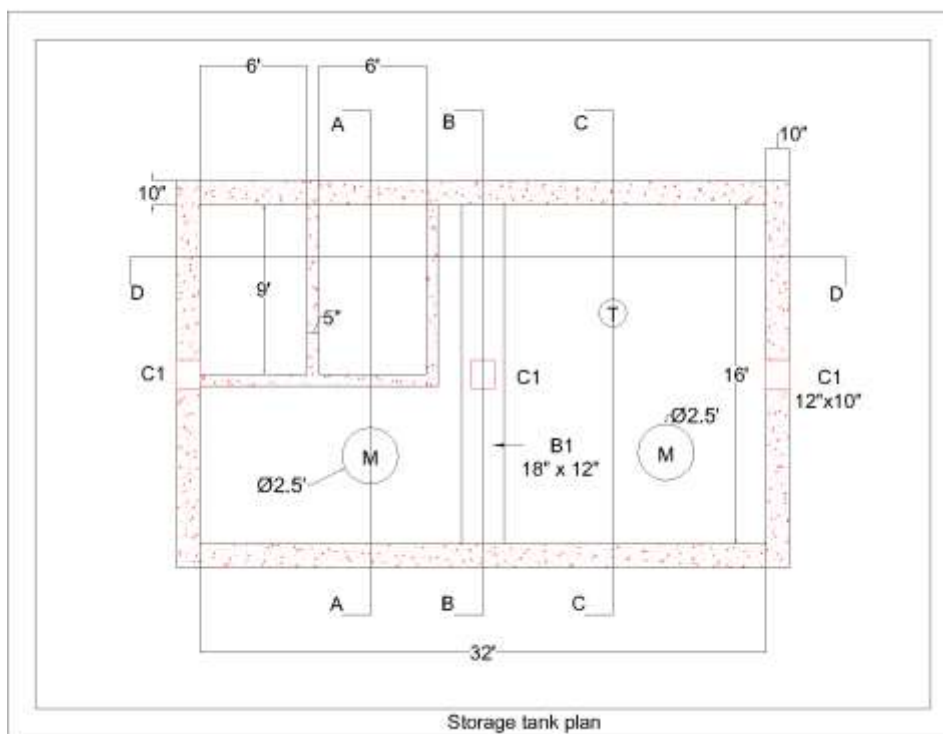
Storage tank plan view for large Institution -scale tank for 75 households
